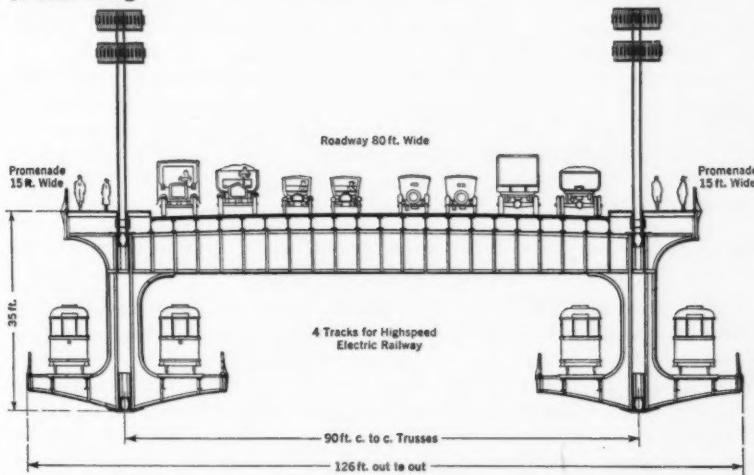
TYPICAL CROSS-SECTION, PROPOSED DESIGN FOR 179TH STREET SUSPENSION BRIDGE
